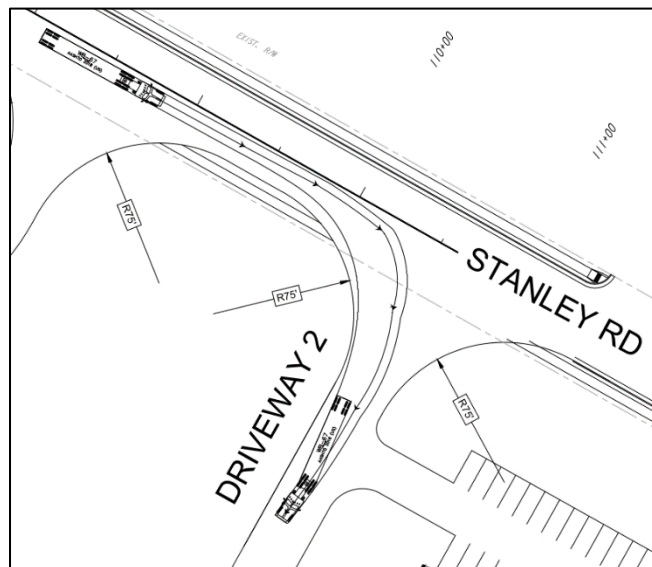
Stanley Road at Driveway 2 – Eastbound Right (Entering Truck)
